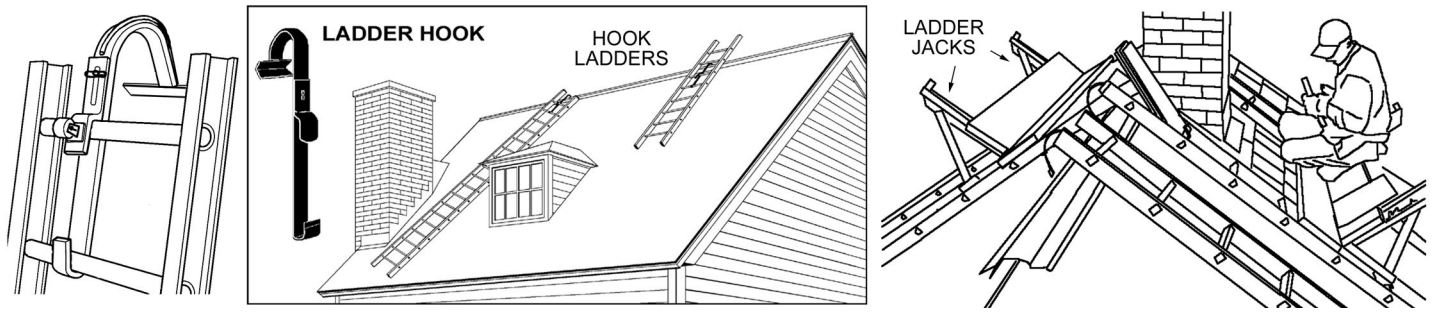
Professional slaters do not routinely walk on slate roofs because foot traffic on slate roof damages the slates. Instead, if there is a ridge to hook onto, hook ladders are used. Hook ladders allow safe access to slate roofs without breakage of the slates. “Ladder jacks” can quickly attach to hook ladders to create a safe work platform or roof scaffold by providing a framework to support wooden planks. Professional slaters may use a combination of hook ladders, ladder jacks and “roof jacks” (Figure 7) when accessing slate roofs.
